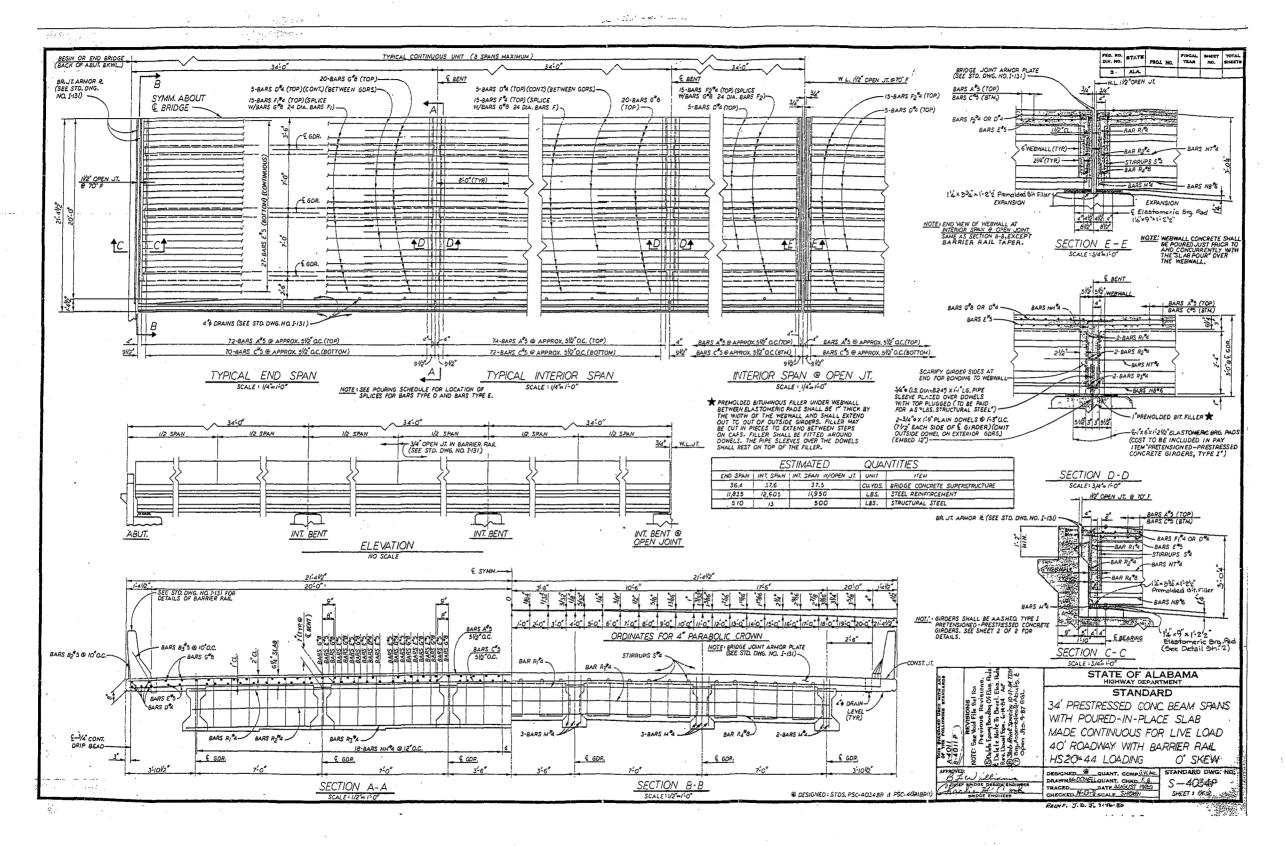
A Typical ALDOT Deck-Girder Superstructure
